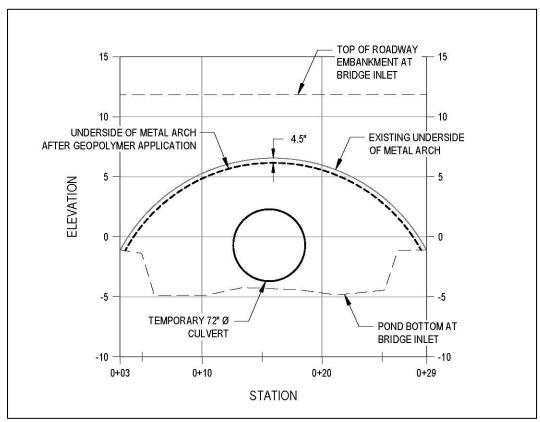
Water Diversion Alternative 2.4 Bridge Inlet Cross-Section
